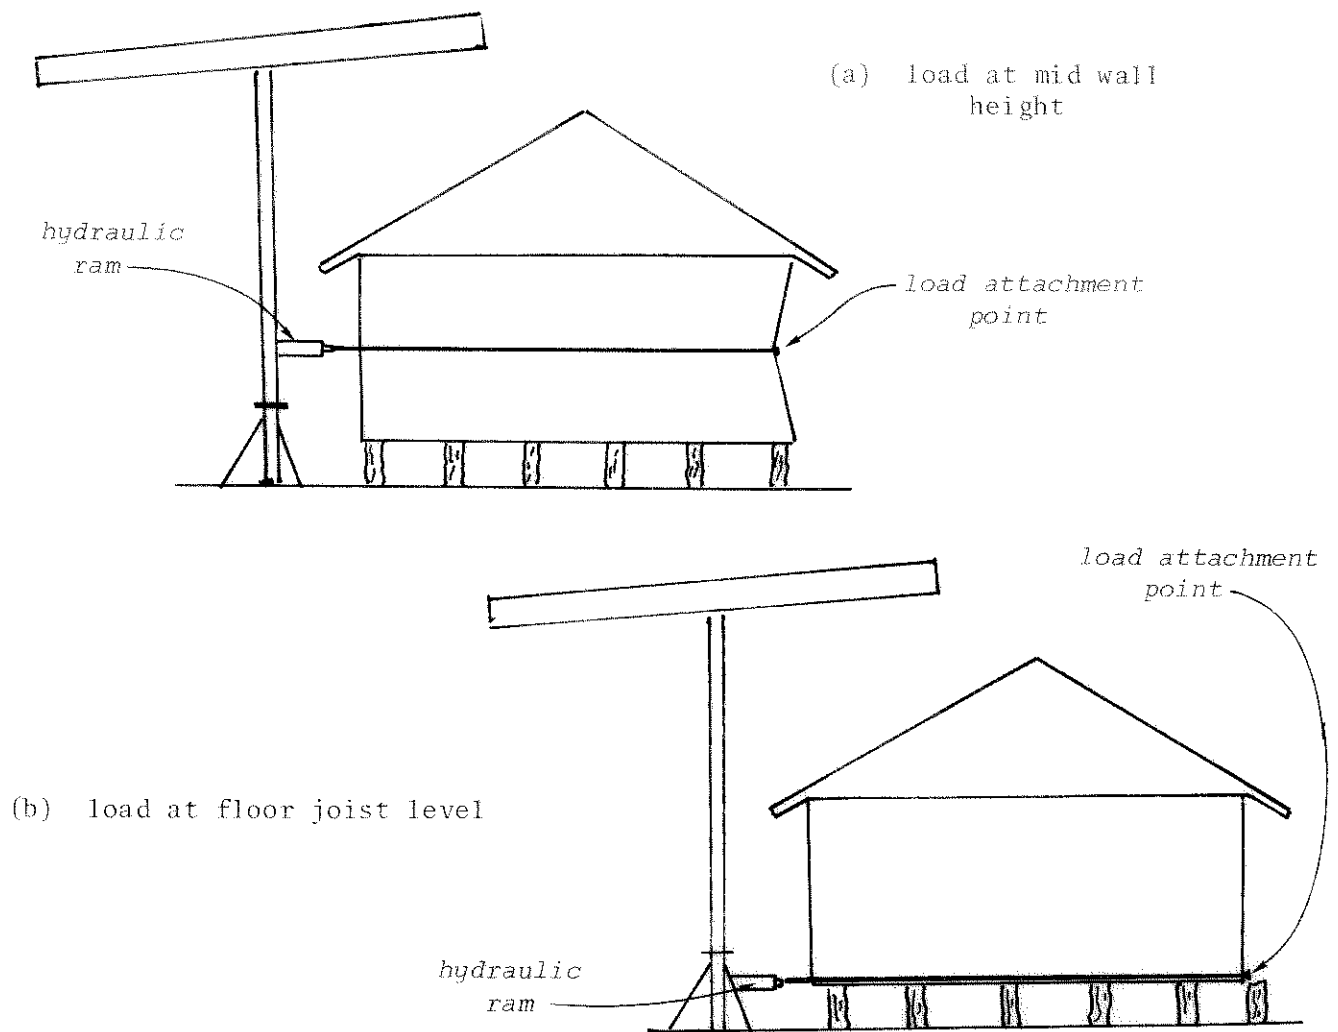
Loading frames used for lateral loads at mid wall height and floor joist level
